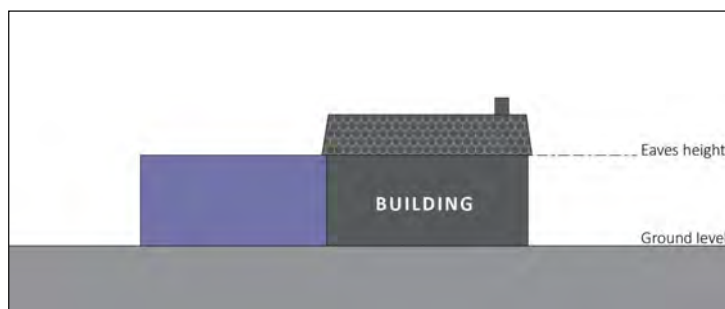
Construction of a single-storey addition or extension to an existing building is exempt if the walls of the addition do not exceed the eave height of the existing single-storey building; (note this graphic does not indicate or specify the form of the roof to the addition)
